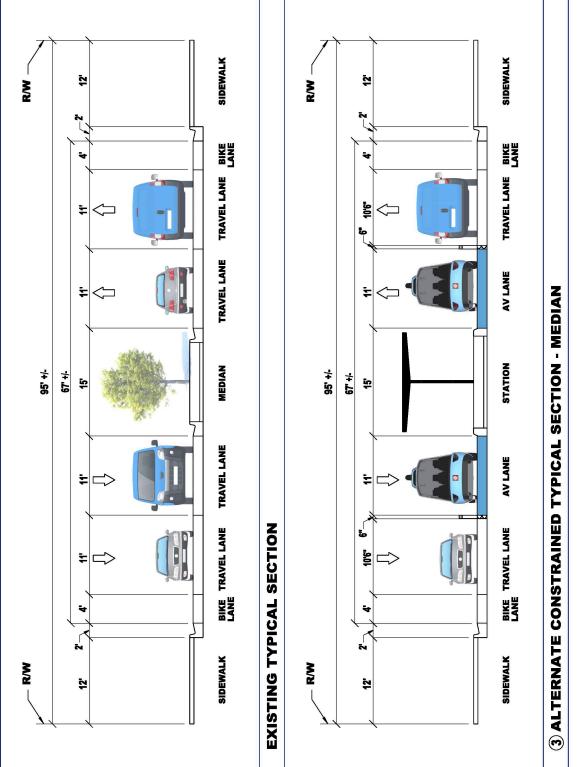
West Corridor Existing and Alternate Constrained Typical Section with Median Station - W. Riverside Avenue
